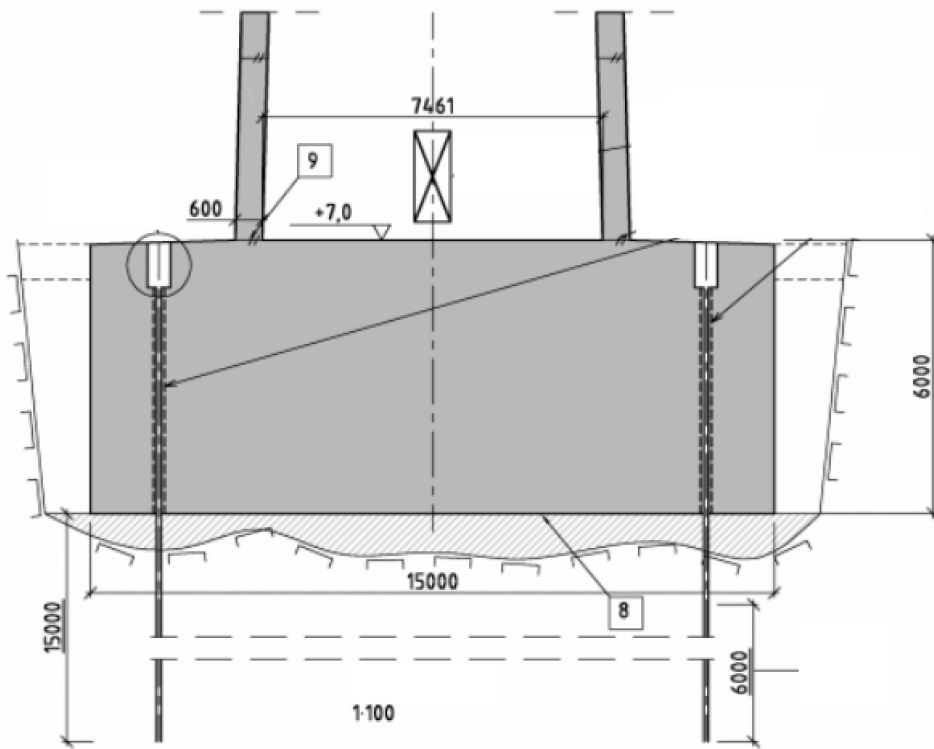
Foundation used on Hardangerbrua. Drawing K405 [13]
